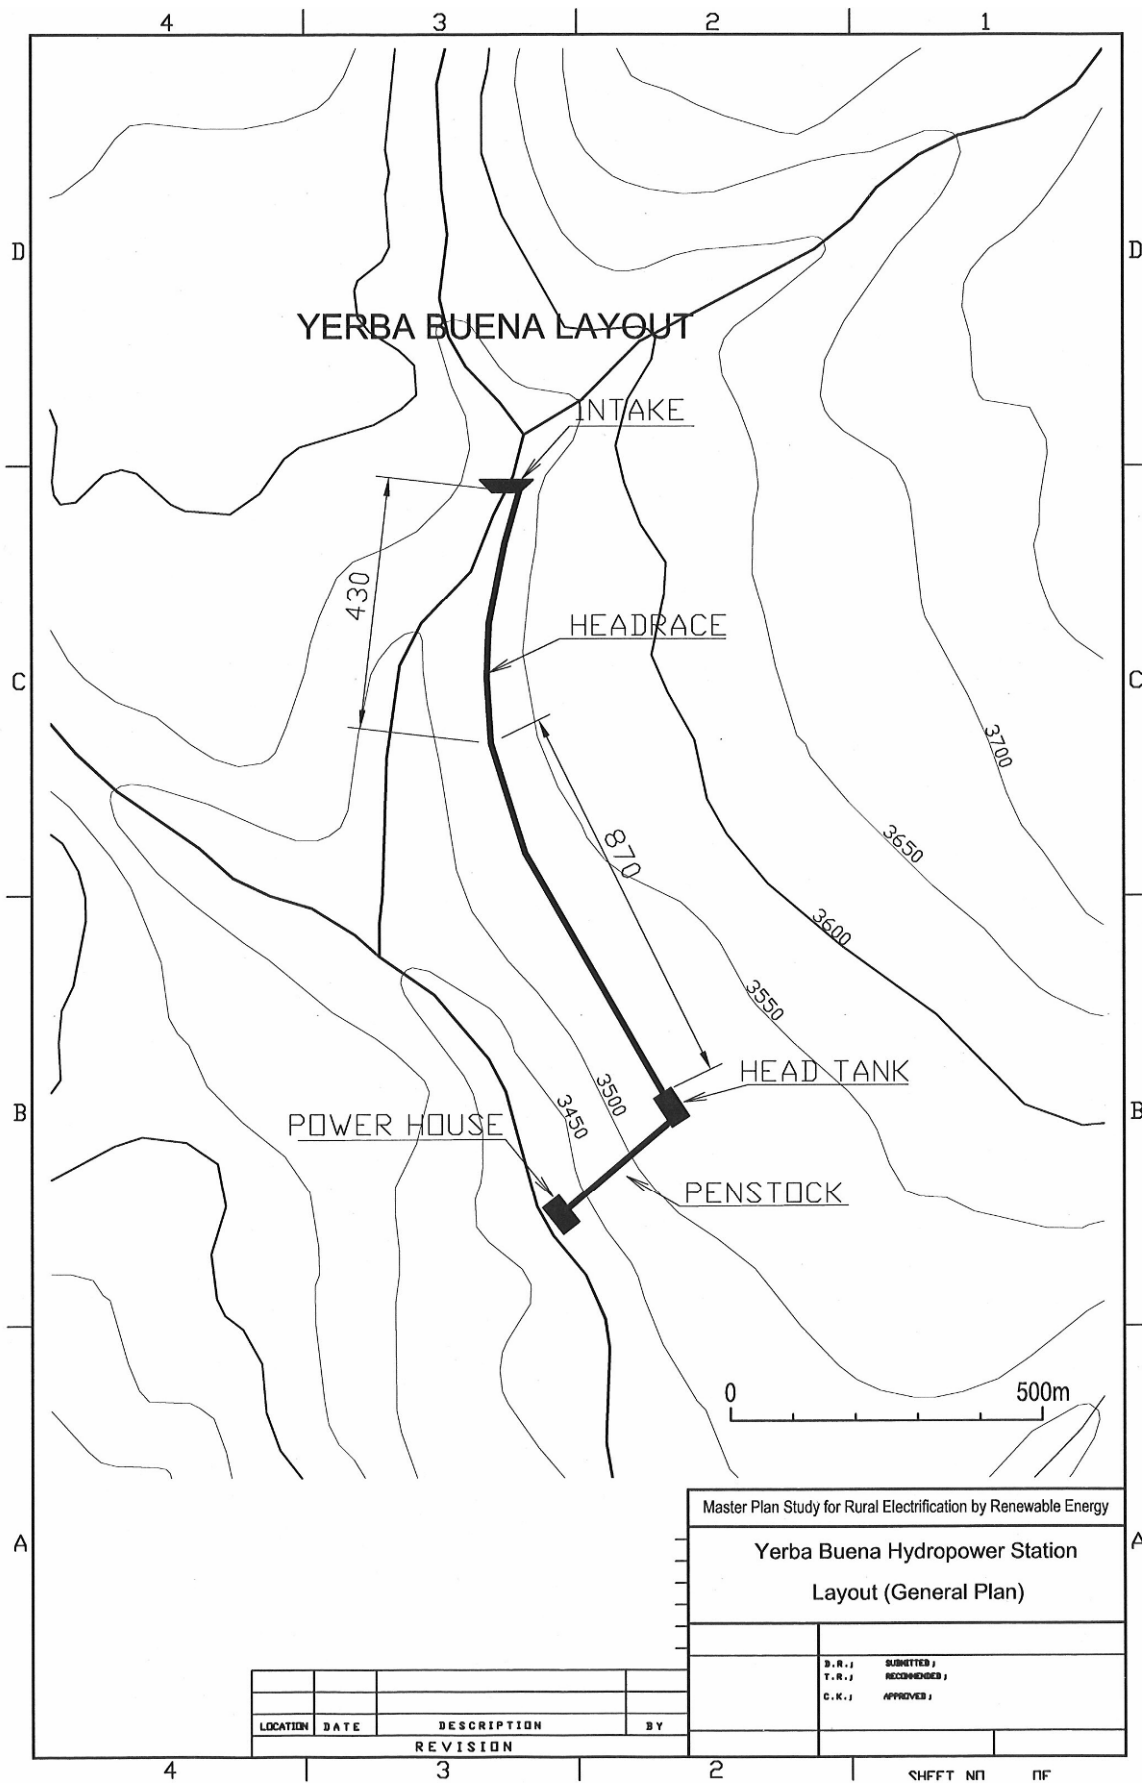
Layout of Power Station (Plan)
